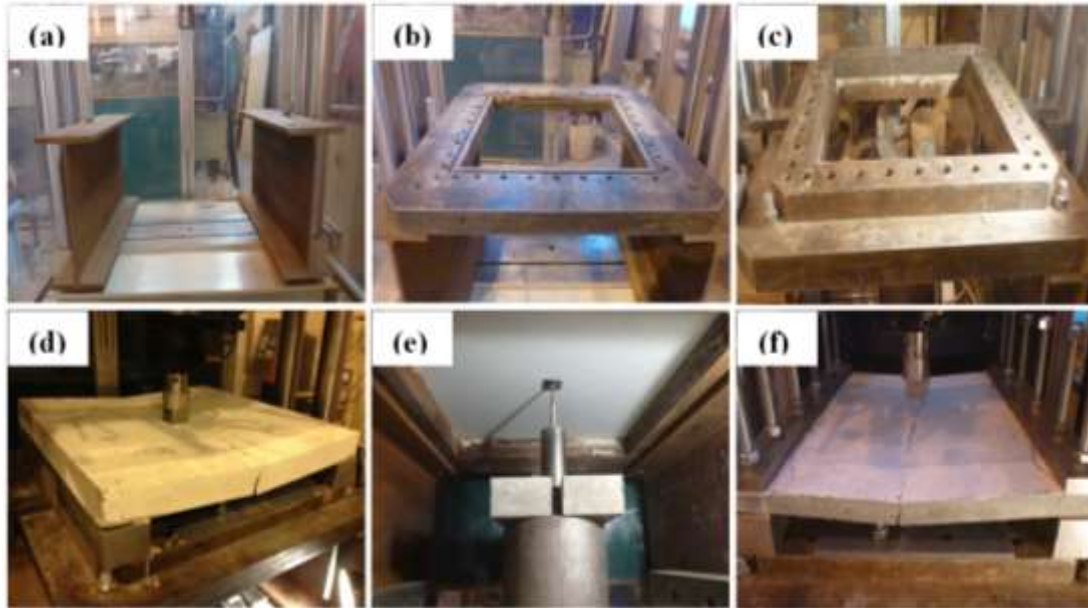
Details of experimental setup (a) I-sections placed at the machine base (b) big frame placed on the two I-section (c) small frame placed on the big frame (d) slab placed on the small frame (e) the LVDT placed at the bottom face of the slab (f) the edge restraint in FF series.
